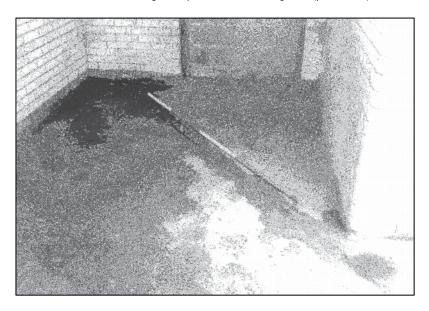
Building A, S part of GF, drain crossing floor, looking N (photo 9/10).
